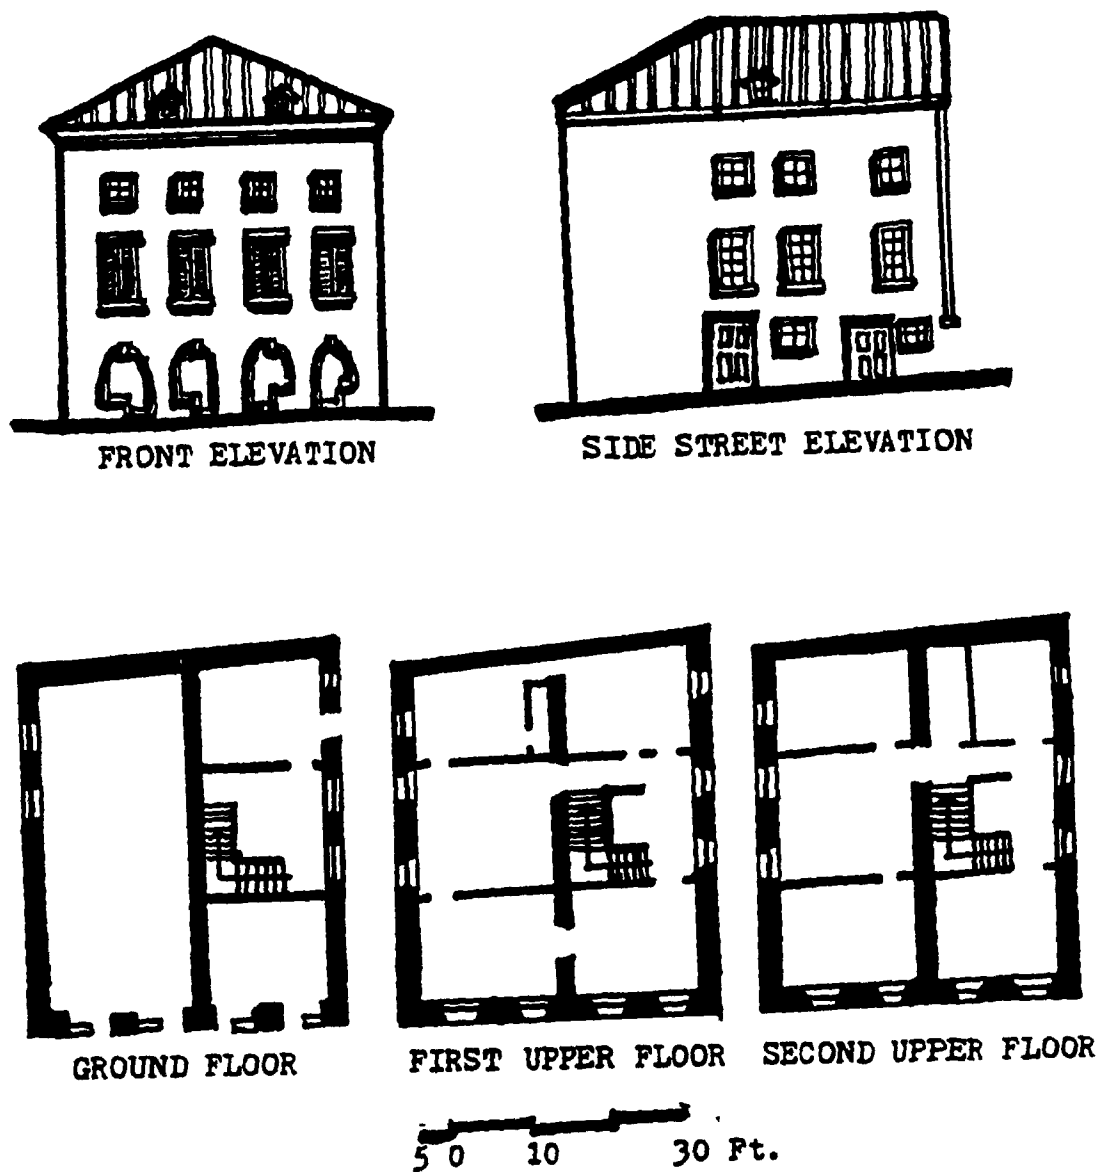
Plans and Elevations of a typical urban house along Placa in Dubrovnik, Yugoslavia.
